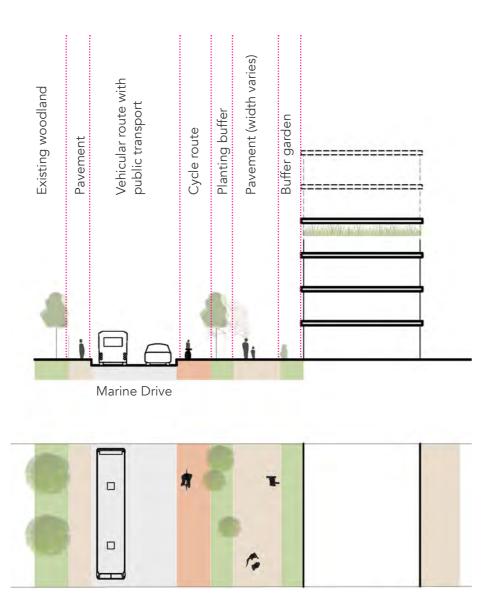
Illustrative section and plan for Marine Drive / West Shore Road $\,$
